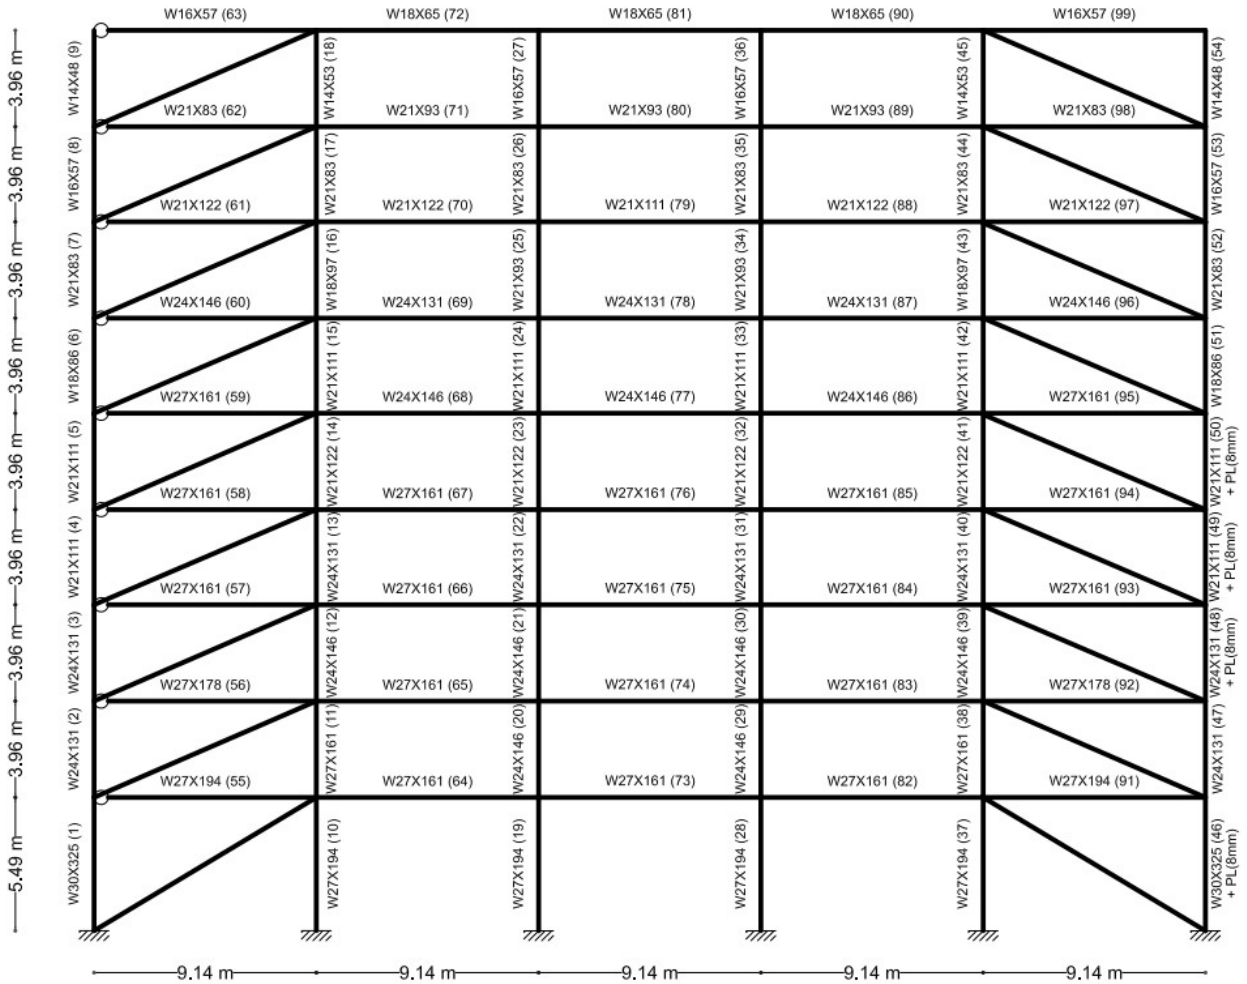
The frame layout, location of dampers, and beam and column section sizes, nine-story frame
